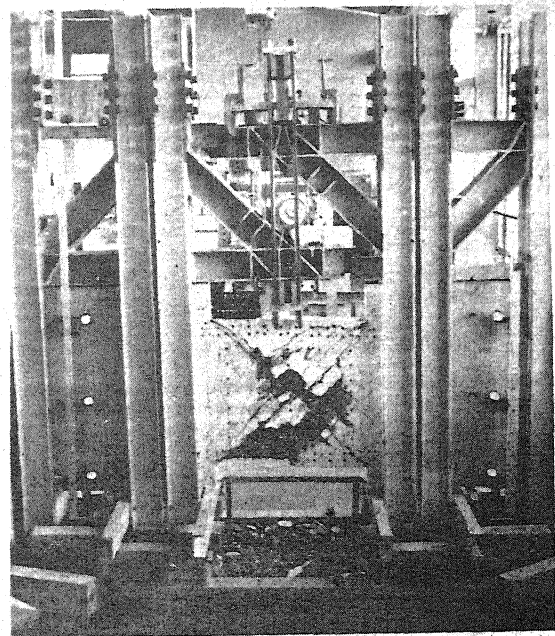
Diagonal Tension Failure After Alternating Loading.
